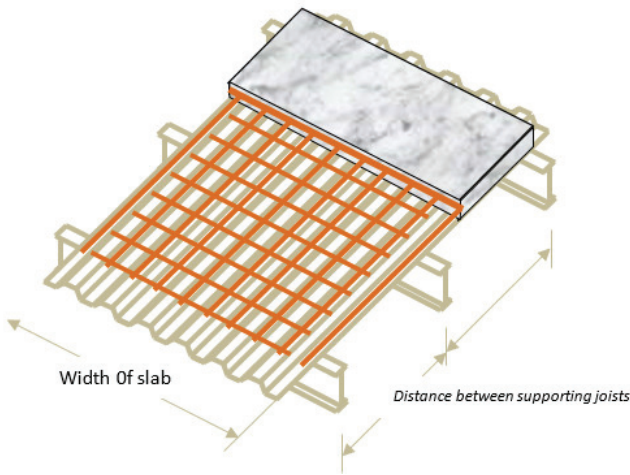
Erection of steel reinforcement and pouring of concrete
